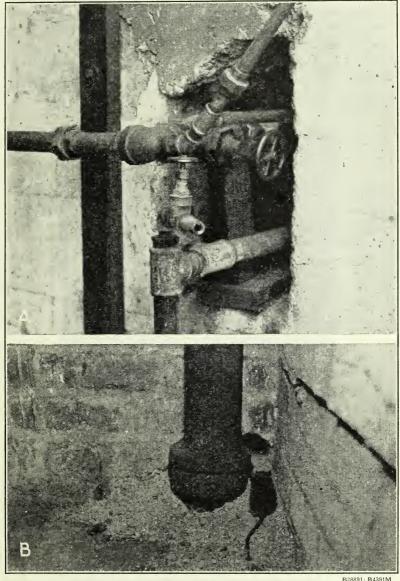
A, Openings around pipes are a common source of rat infestation; B, situations like this give rats access to otherwise rat-proof buildings
